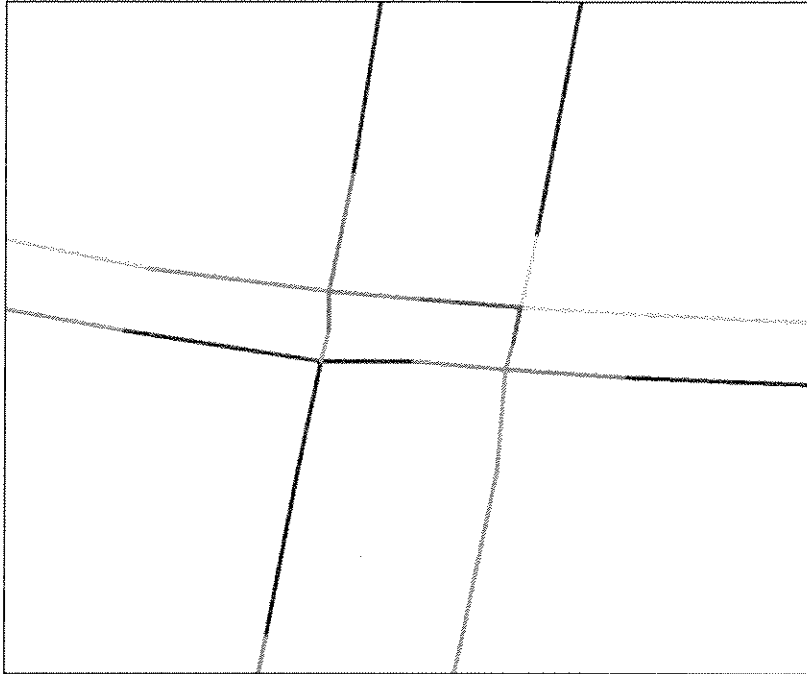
Original Intersection of I-87 and Washington Ave Ext.
